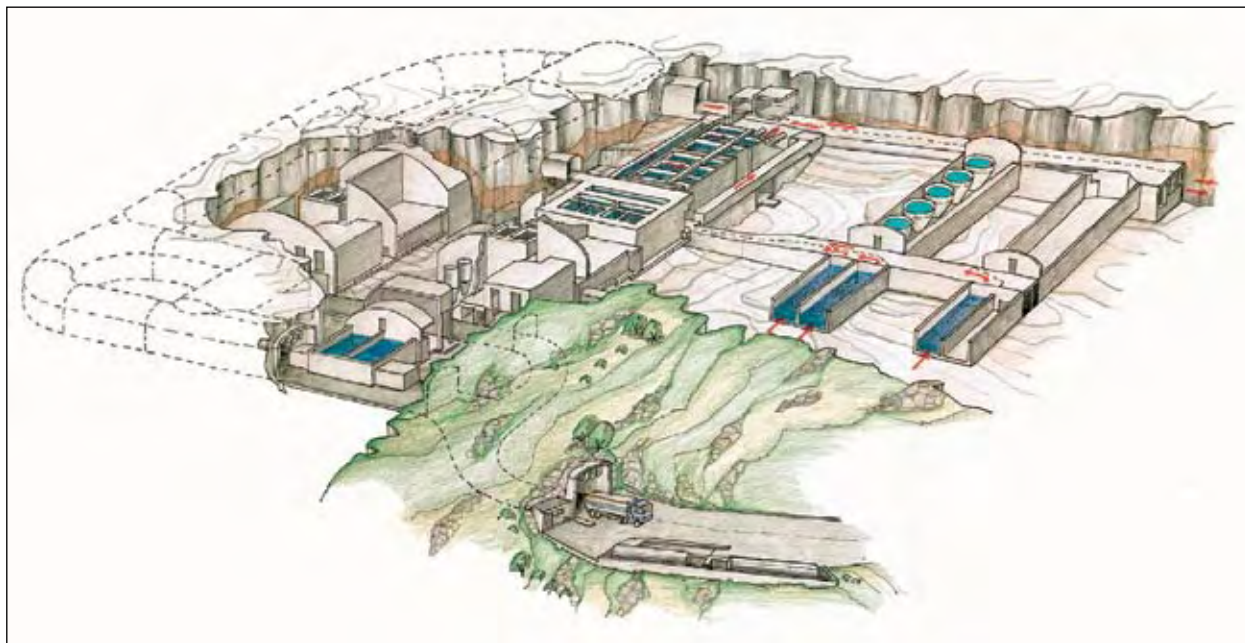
The new plant and its access tunnel portal to the left. Part of the existing plant to the right. Illustration: Krüger A/S
